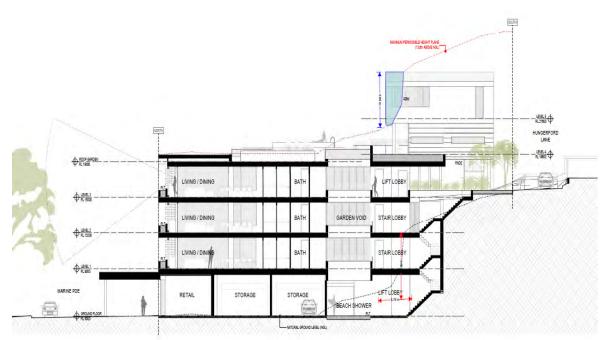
Extract of section plan – note: exceedance to building height resulting from excavation
